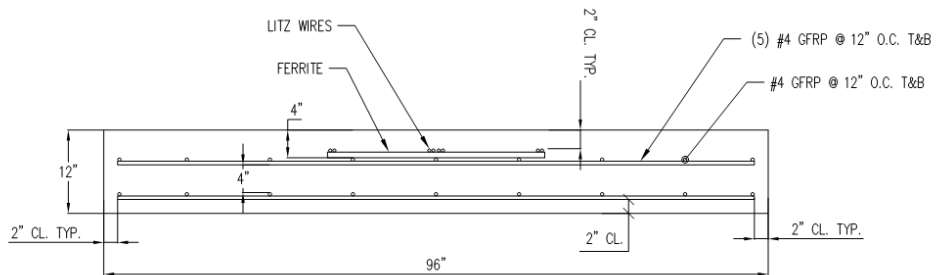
Cross-section detail-A of typical electrified precast concrete slab
